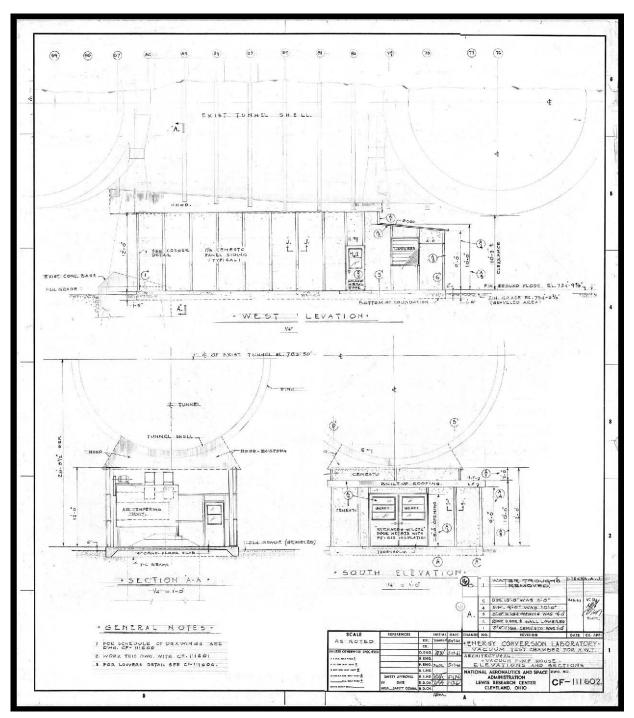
Vacuum Pump House elevations and sections drawings, 1961 (OH_Cuyahoga_Space-Power-Chambers_063).
